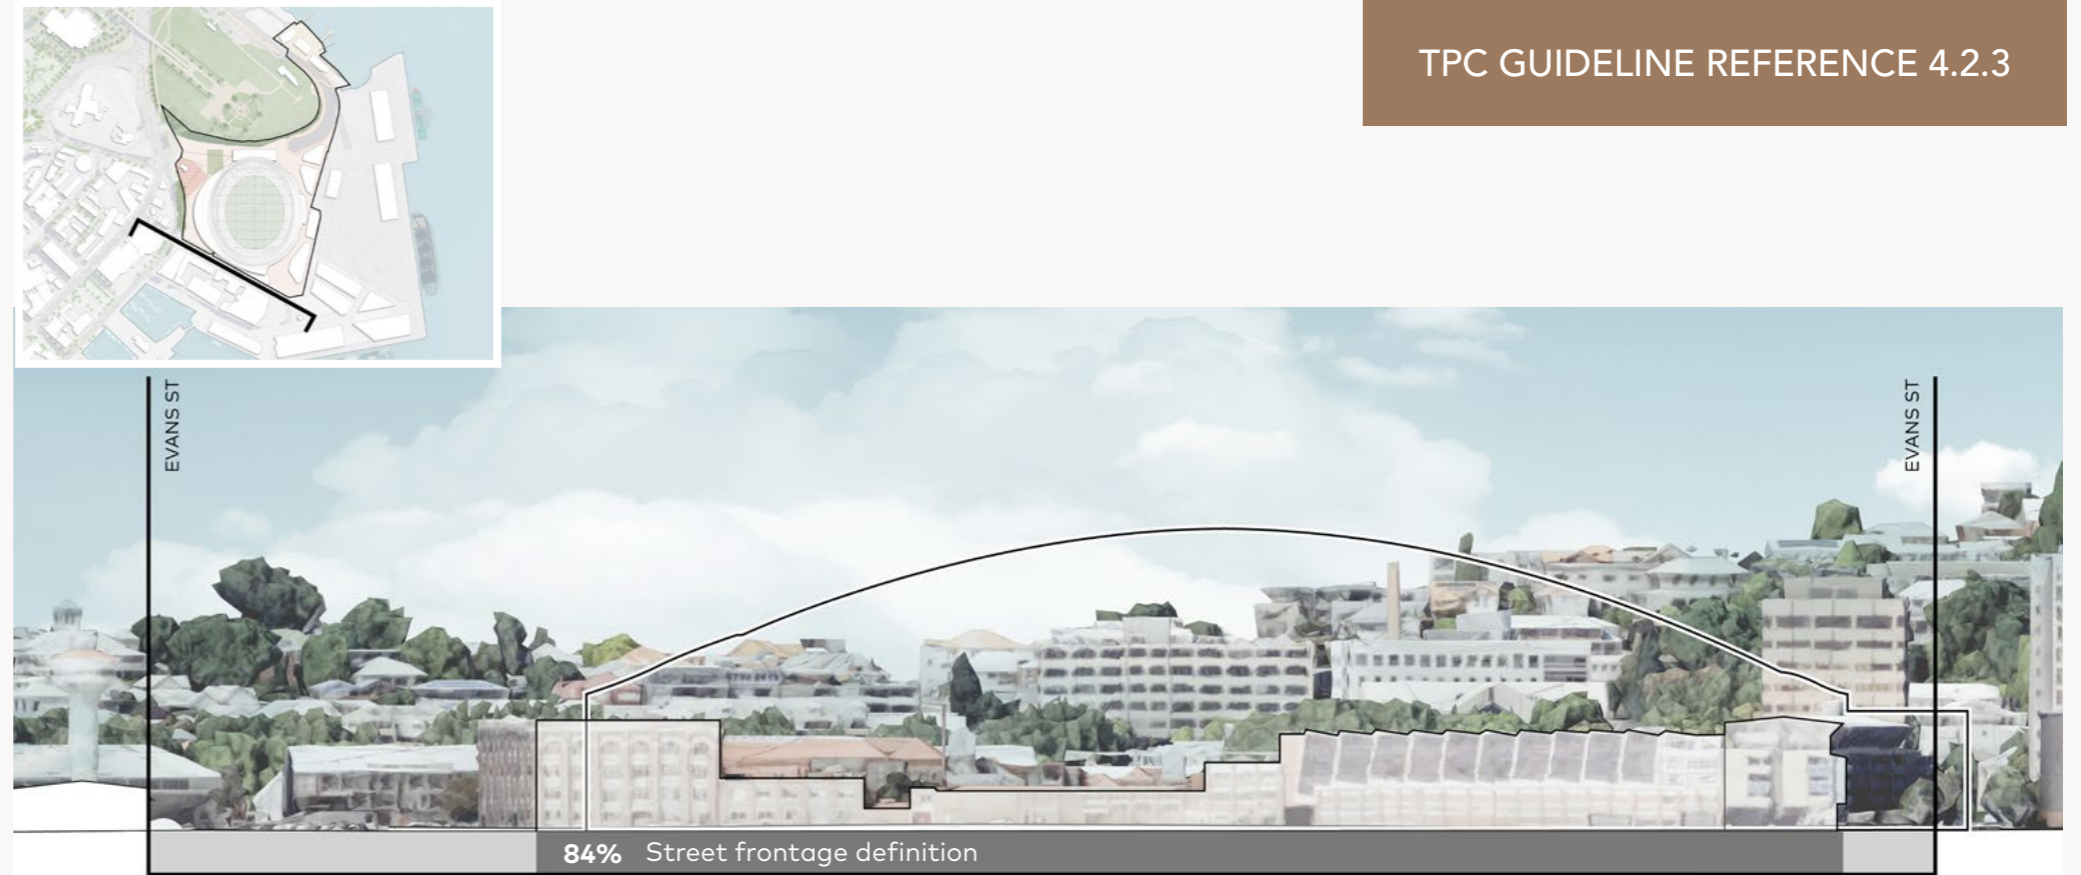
Evans Street southern elevation (Source: Urban Design Framework, page116)
